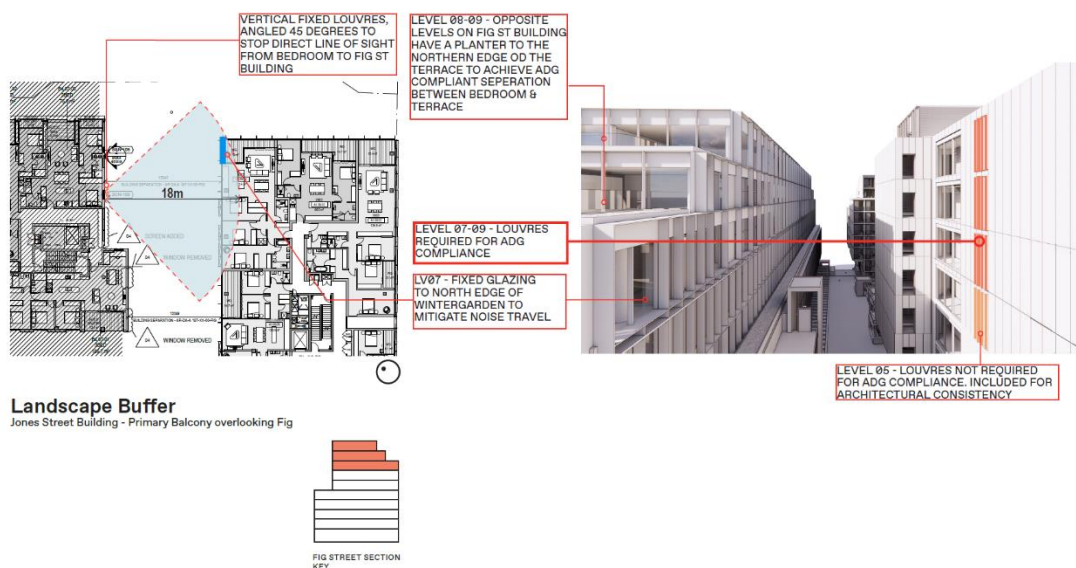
Privacy protection measures - Fixed glazing: Fig Street Building to Jones Street Building
